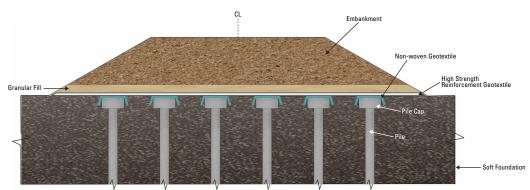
Typical section of Mirafi® high strength geotextile reinforced embankment on piles
